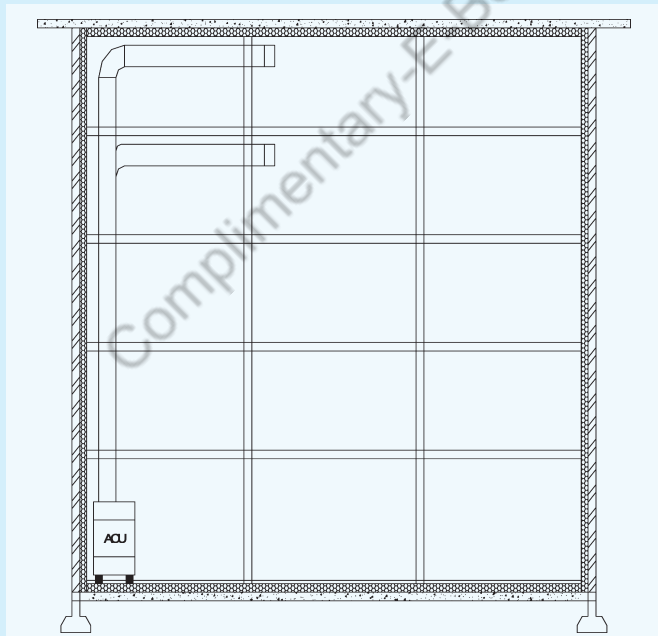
Typical cold store with R.C.C. slab roof & floor mounted air cooling unit with ducting
